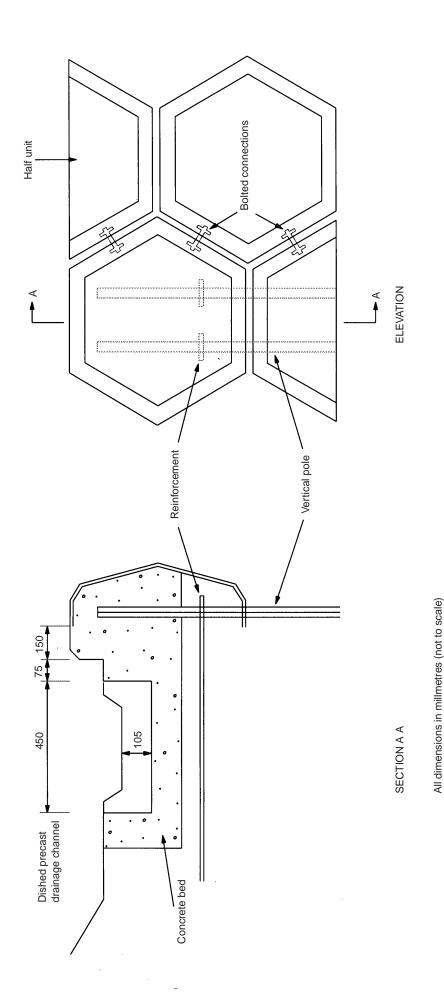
Details of the top of the reinforced soil wall at Whitley Bridge
